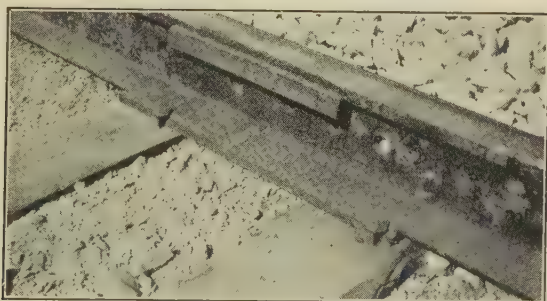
Base-plate, head-bar joint installed on 7-in. rail.
